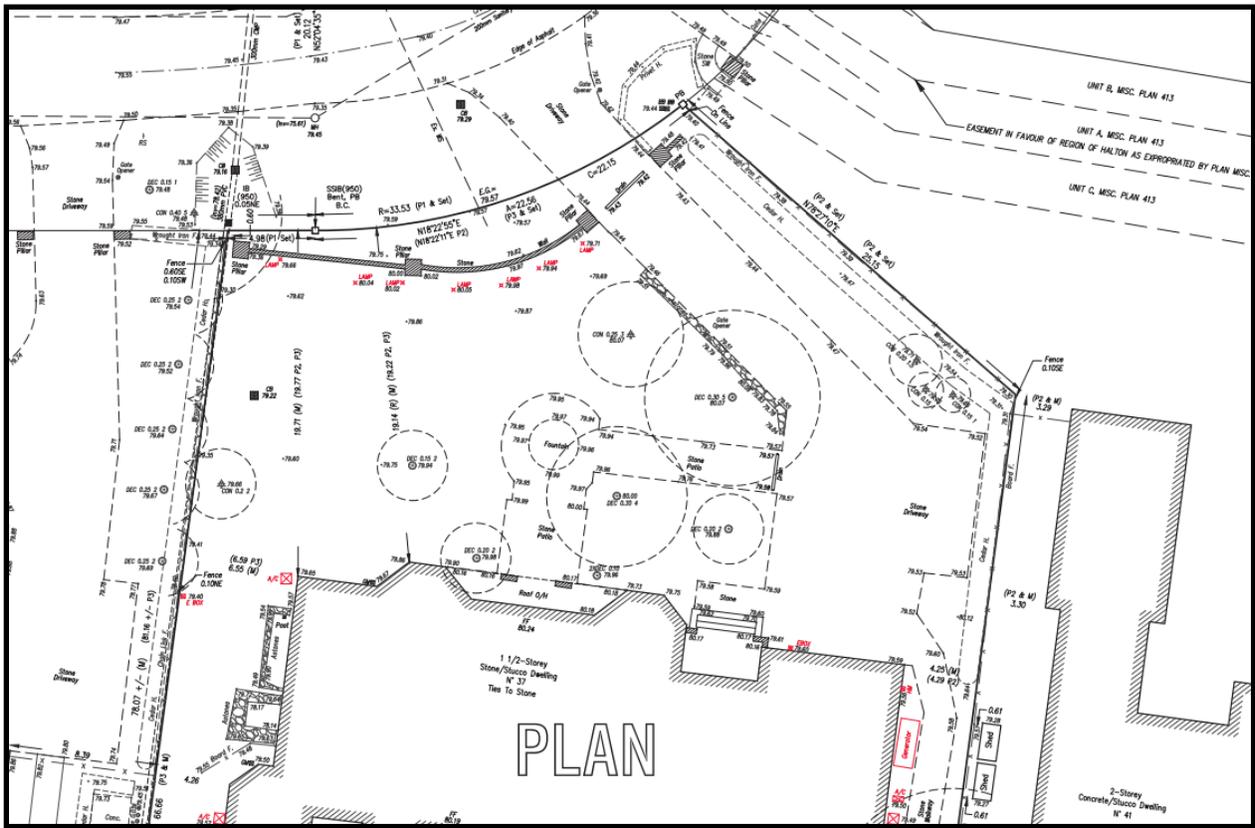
Existing Driveway Condition – 37 Colonial Crescent
